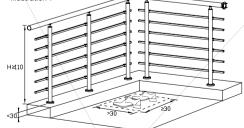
(without parapet), Illustr. 7 (with parapet)]
